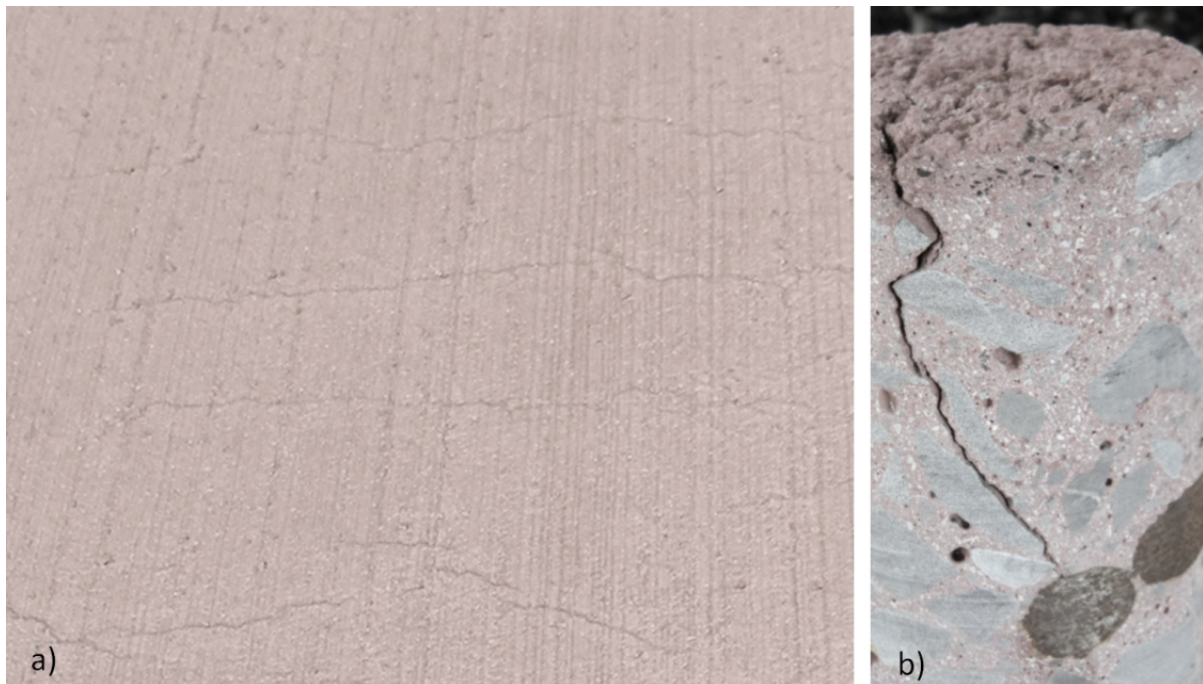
a) Typical plastic type crack pattern in a concrete slab clearly showing the reinforcing steel layout. b) Drilled core of slab showing the penetration of the crack to the depth and location of the reinforcing steel.
